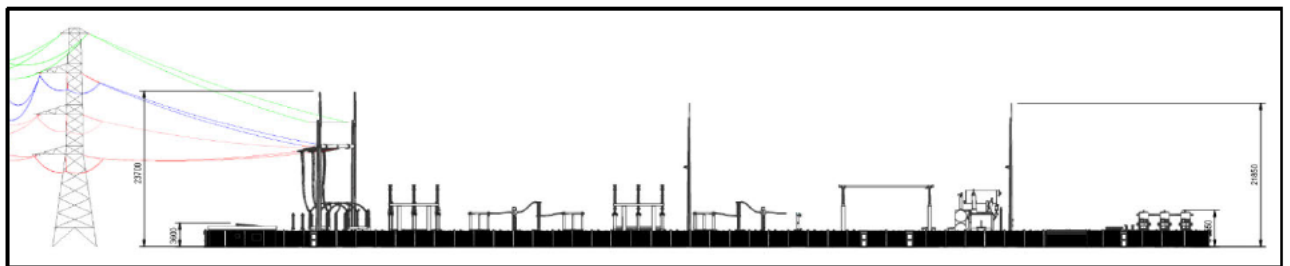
Haldon collector and 220 kV substation elevation drawing (refer to drawing 2429039-UP-004)
